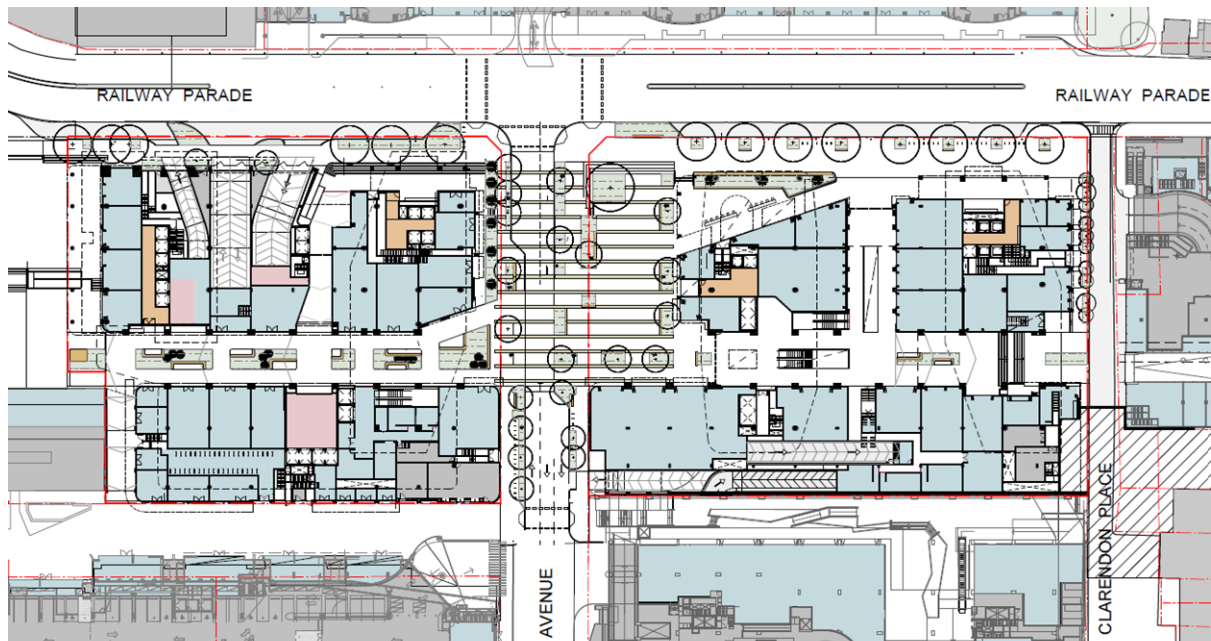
Extract of Proposed Site Plan AR-DA-1107
